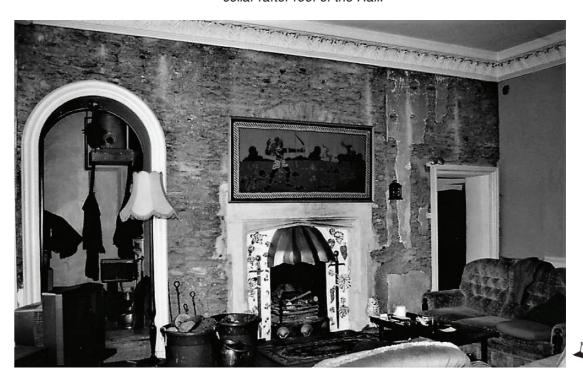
Halswell, the Solar above the Hall in c. 1980, with a late sixteenth-century fire surround (with later additions) and relieving arch above. The wall is punctuated with fixing holes for panelling.
